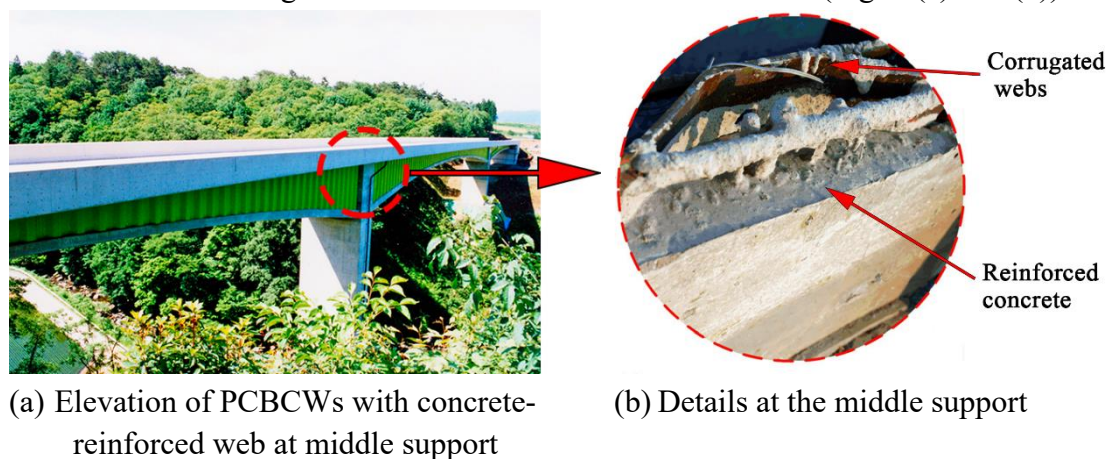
Prestressed composite girders with concrete-reinforced web corrugated webs^[28]
